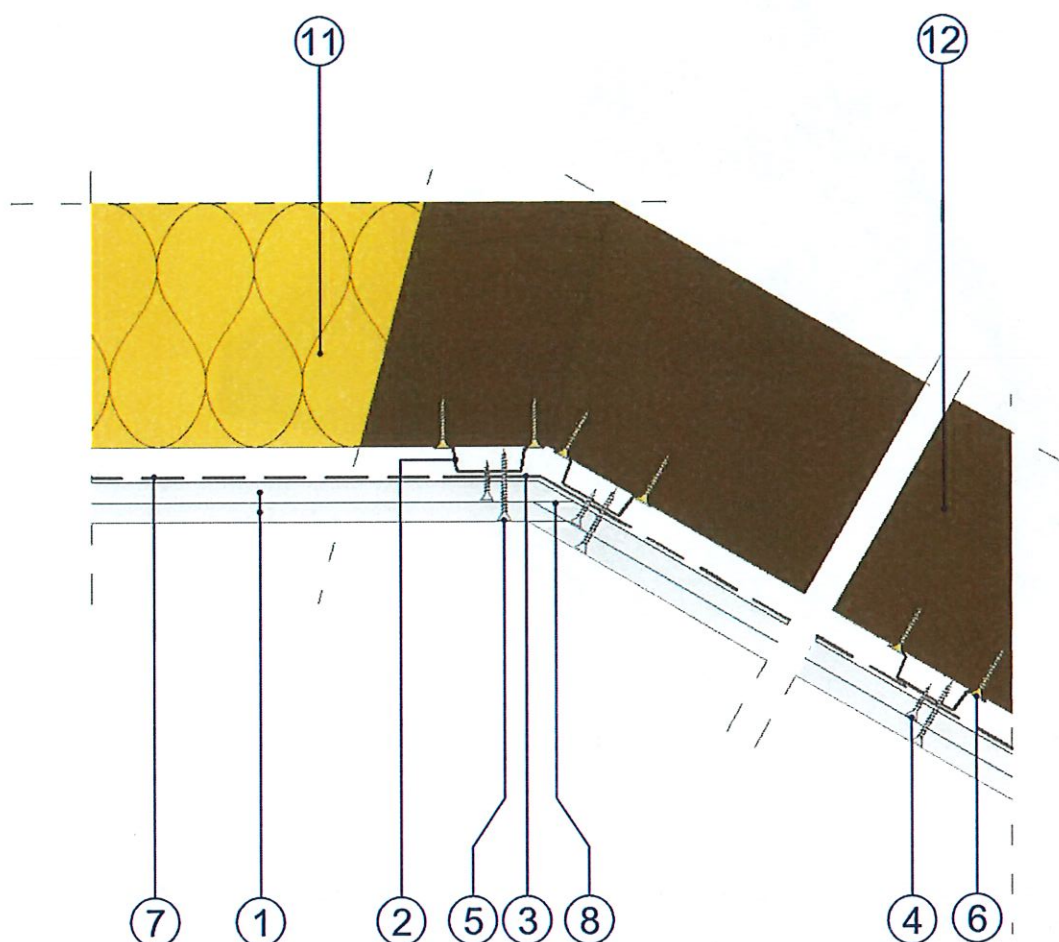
Horizontal section of the roof casing with the framework made of profiles CD 60 and flat hangers type L
